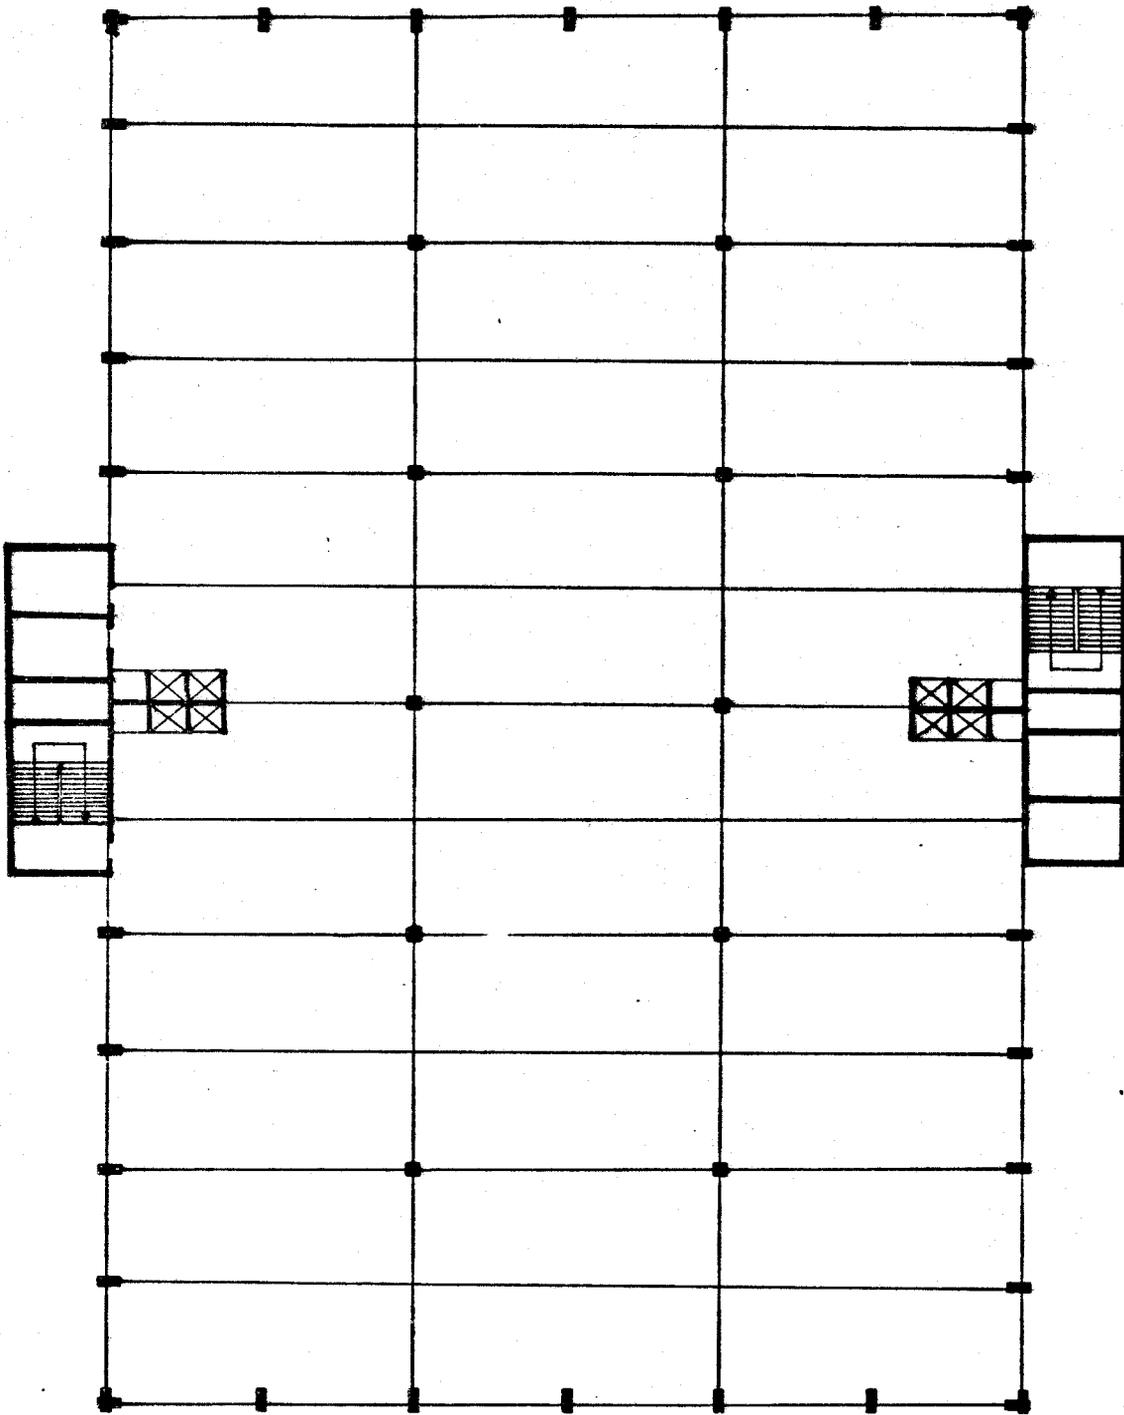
STRUCTURAL PLAN OF A OFFICE BUILDING WITH THE EXTERIOR CORE.
